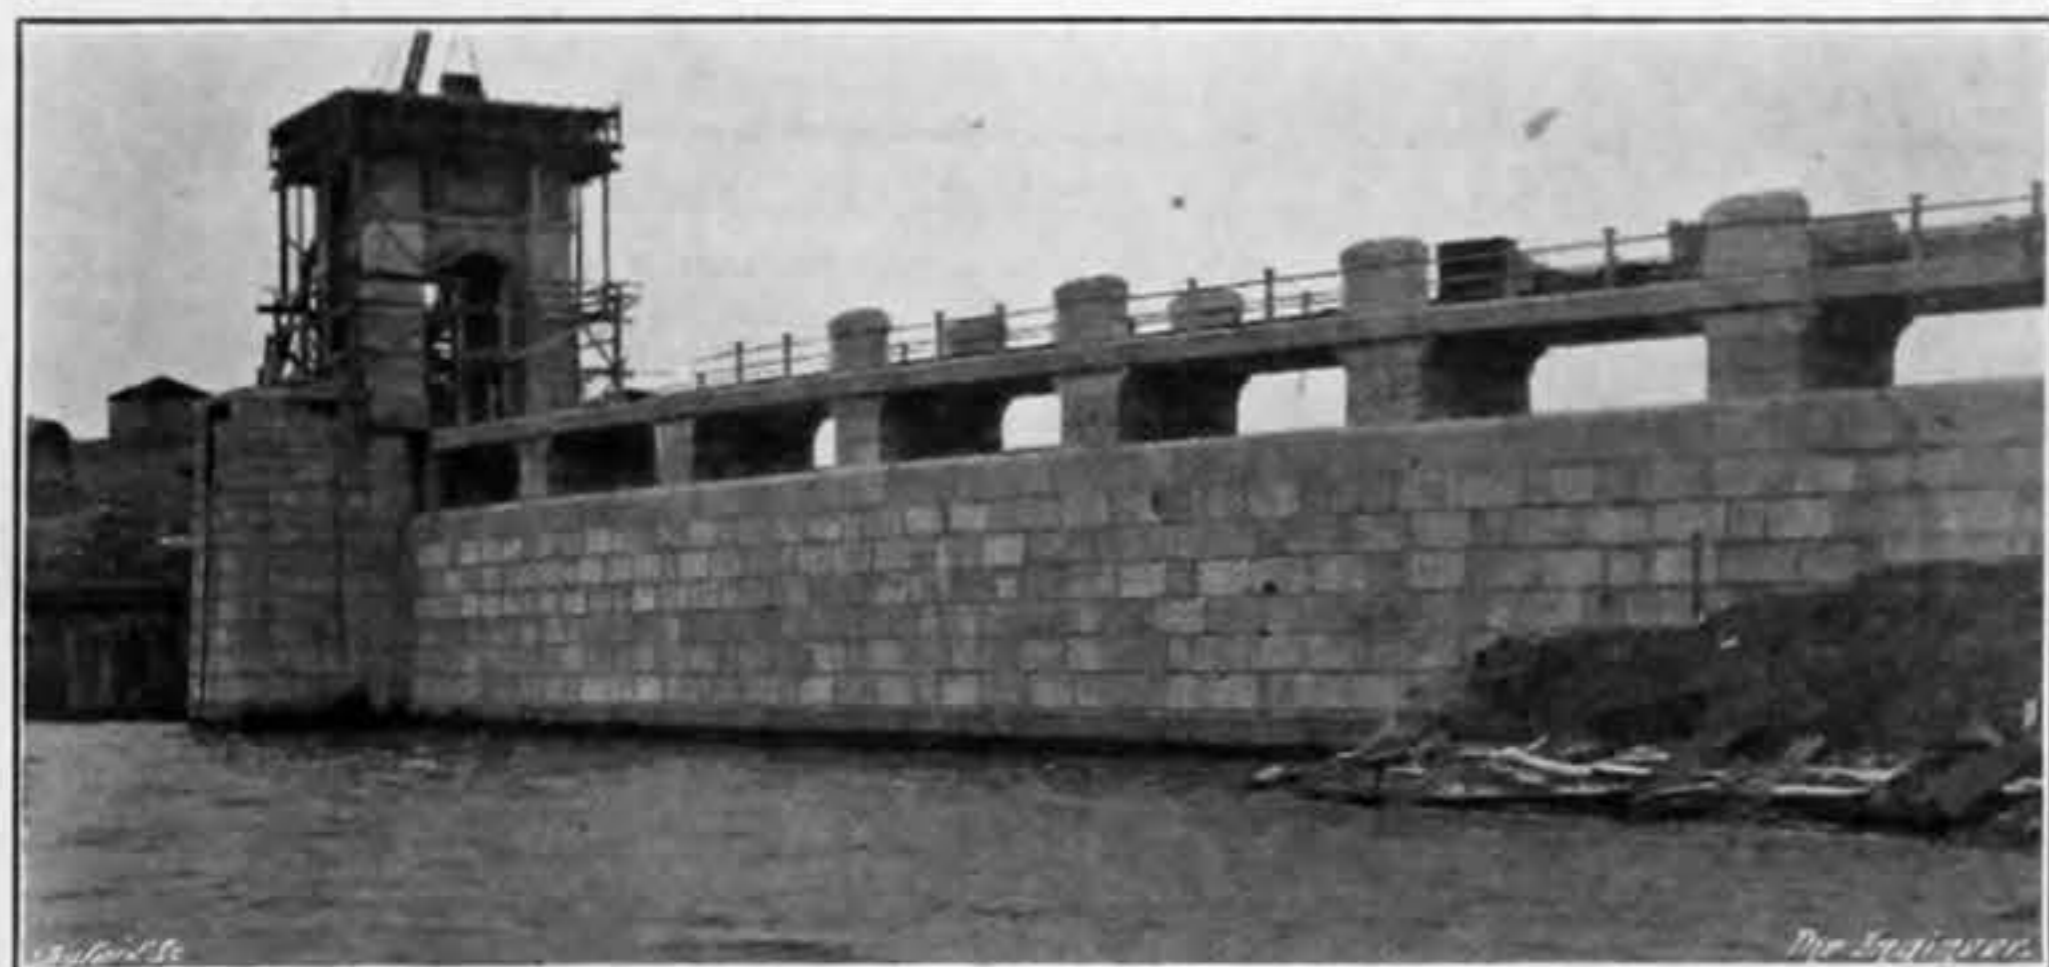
UPSTREAM FACE OF ALWEN DAM SHOWING OVERFLOW SILL
